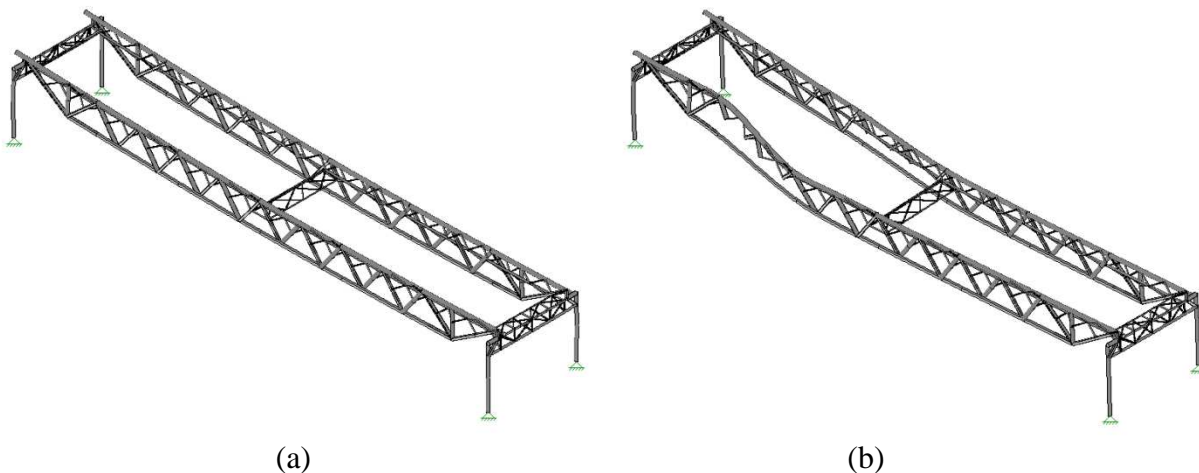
Numerical model showing deflection at 20 times magnification for the service load of 4.5 kN: (a) control truss; (b) damaged truss (Specimen 7)
